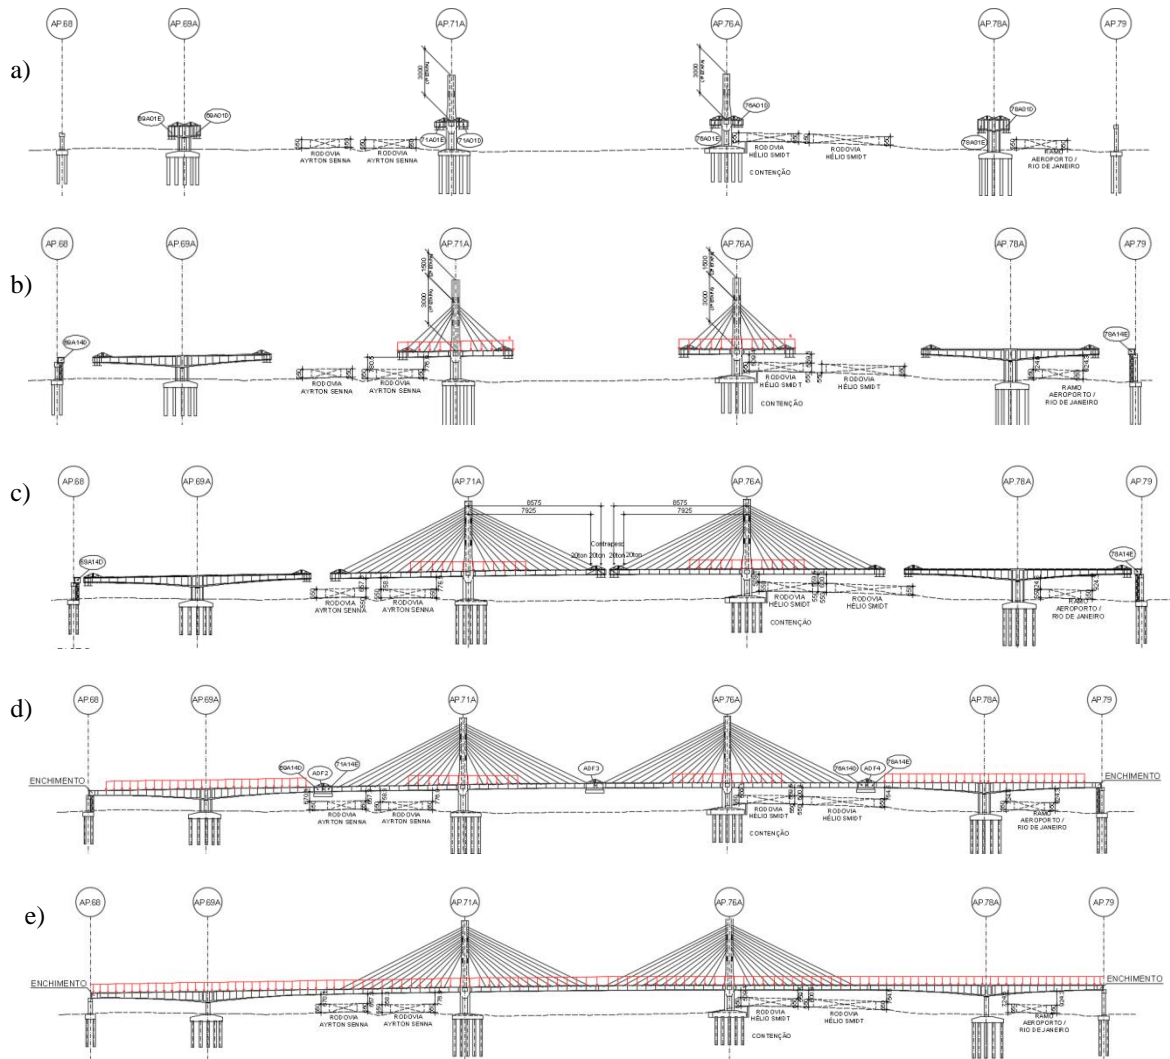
a) First stage of the tower and first deck segment building. b) Construction until the fifth segment, and building of the second part of the tower. c) The box girder segmental bridge, except for the closings and the segments 6 a 13 of the cable-stayed part built. d) Closing segments added. e) Final structure.
